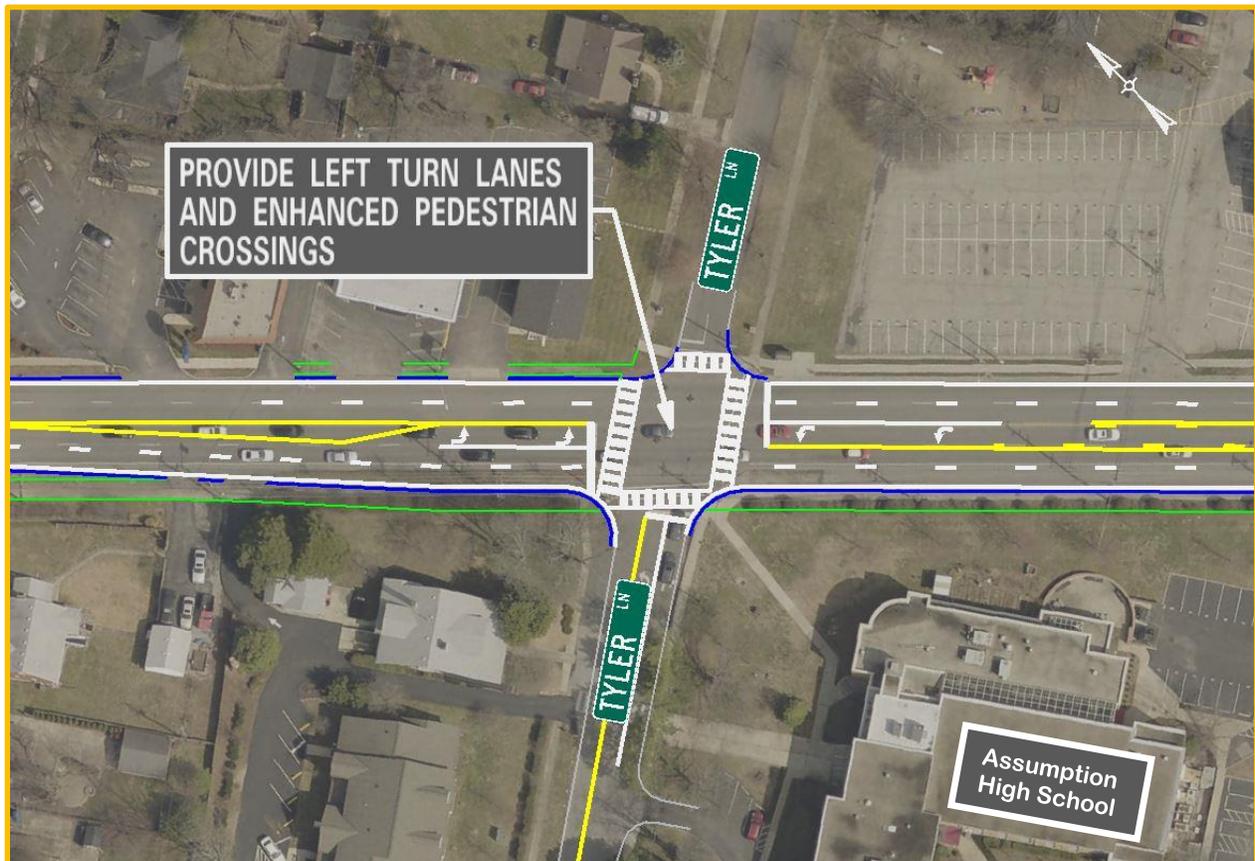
Bardstown Road at Tyler Lane—Proposed Configuration
